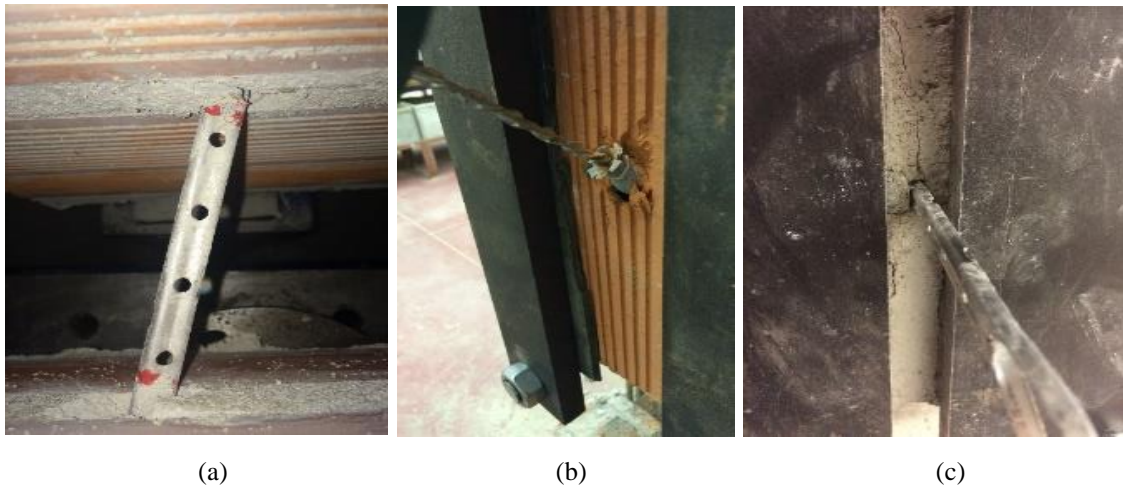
Failure modes: (a) plastic deformation of T2, (b) pull-out of T5 tie e (c) degradation of surrounding mortar on T2 wall tie
